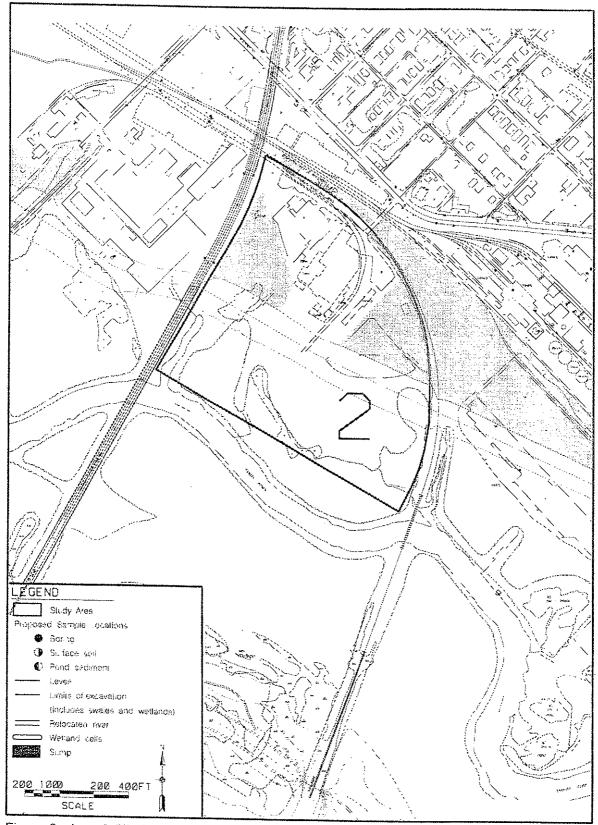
Area 2 Site Plan with Proposed Sampling Locations and Construction Elements.
